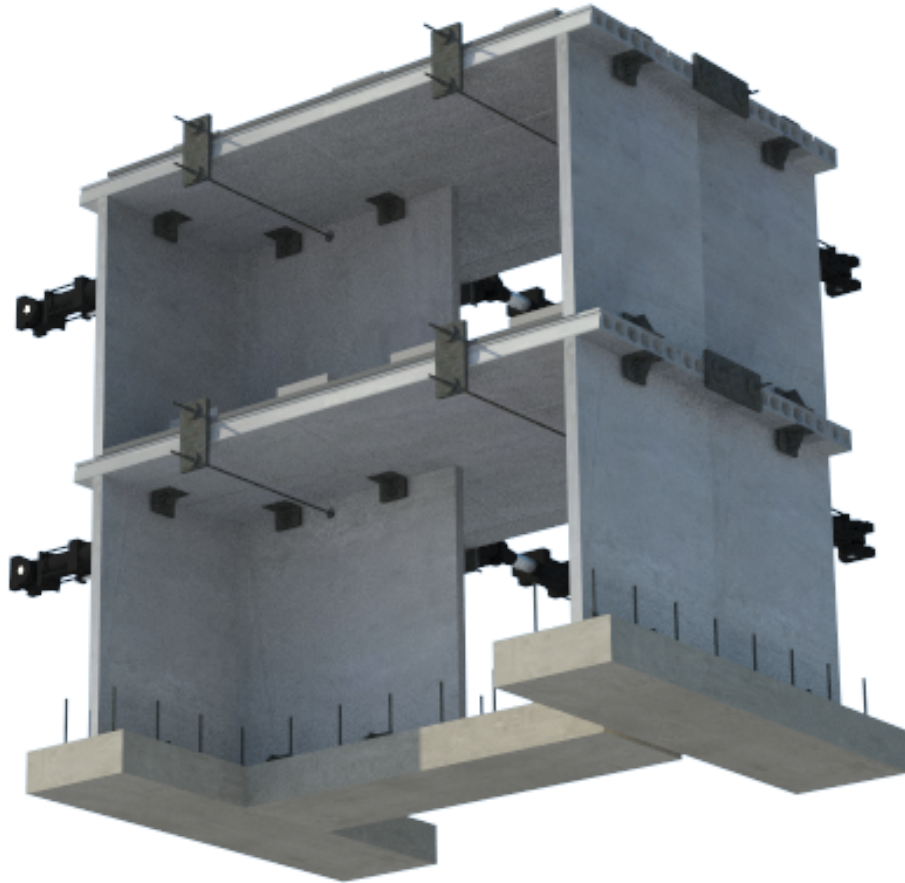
Isometric views of the installed instrumentation – Bottom side, front view.
